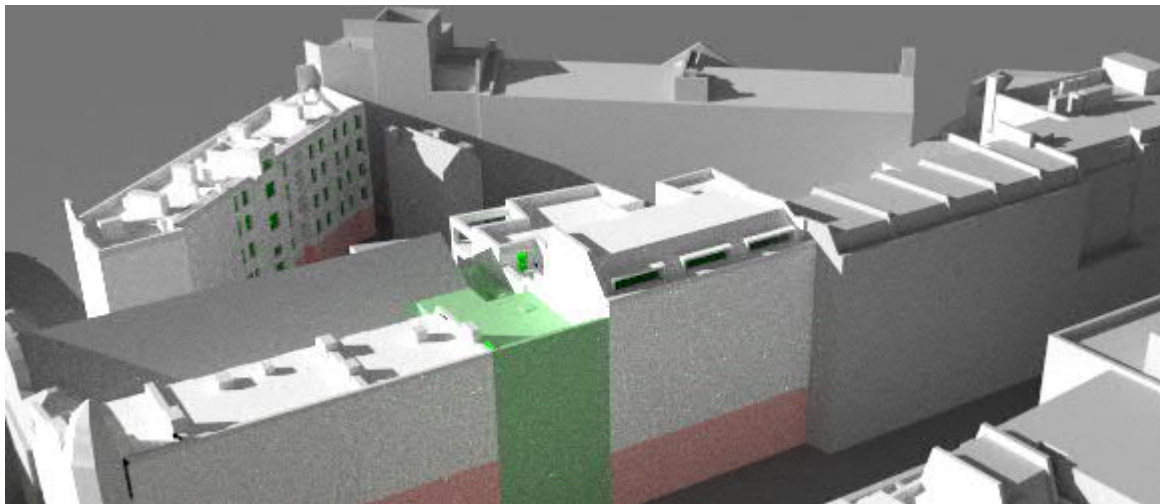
Image of the existing (green) site model (terrain not shown)
